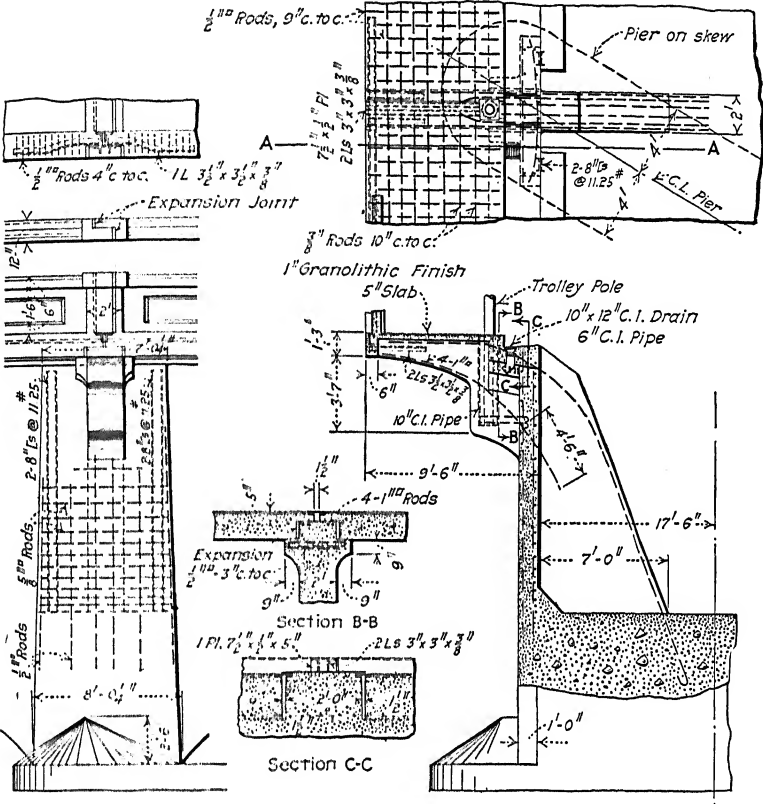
Counterforted spandrel wall, highway bridge at Ansonia, Conn.
